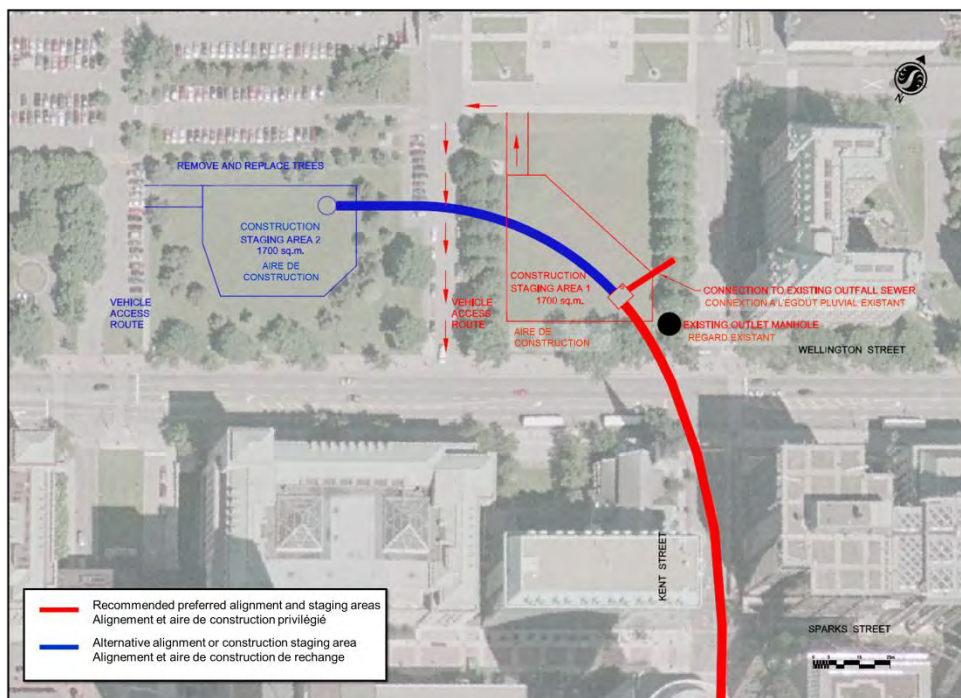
Site 2 Wellington at Kent; site plan of the Project Area showing the preferred alignment and proposed staging areas.
